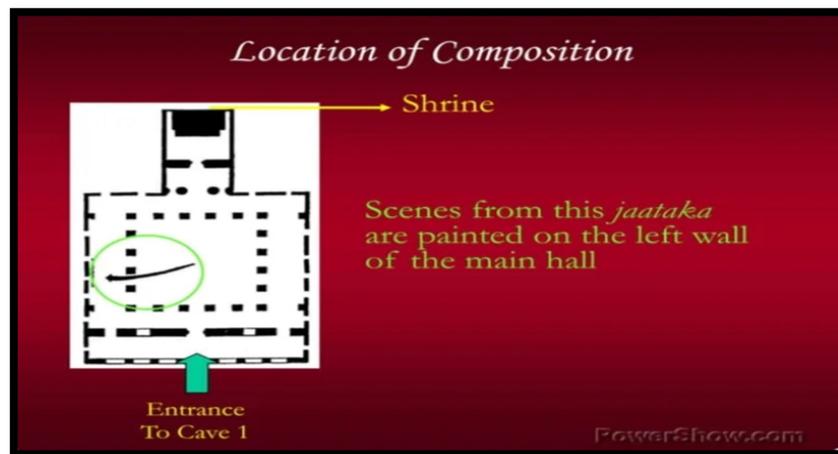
ground plan of cave no.1 at Ajanta (source- slideshare.net)
